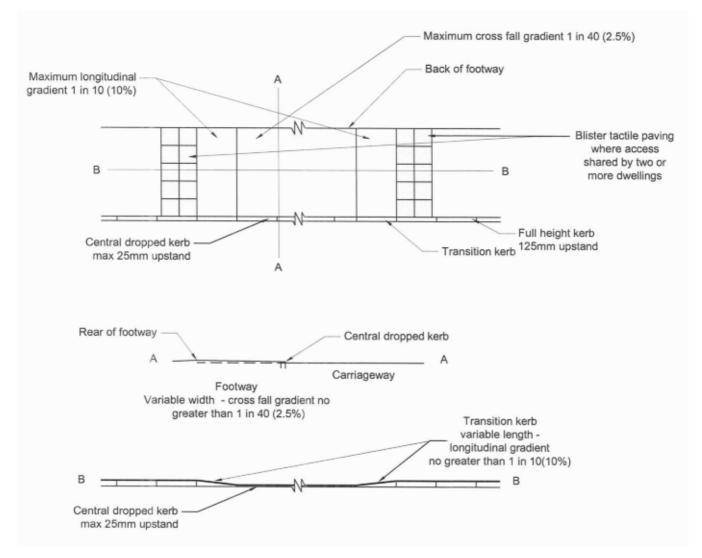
Kerb and tactile paving detail in respect of standard access to 2 to 5 dwellings over footway (only to be used on Class 4 highway or below).
